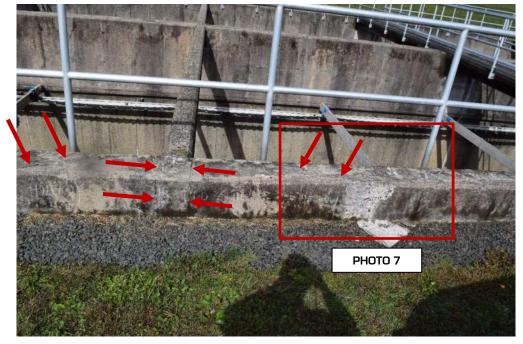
& 5 – South Wall of Basin No. 2 at West Bracing Strut (Looking North)
